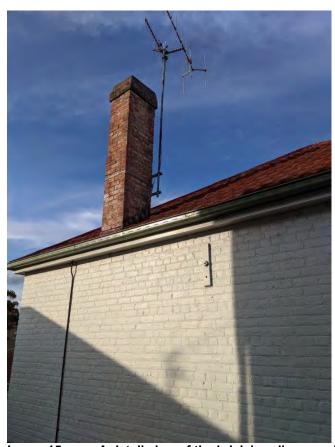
A detail view of the brick bonding consisting of three stretcher courses and one header course which is known as Flemish garden wall bonding. Note the damaged brickwork in the chimney flue. Restoration of the brickwork and re-pointing will conserve the two chimneys.
